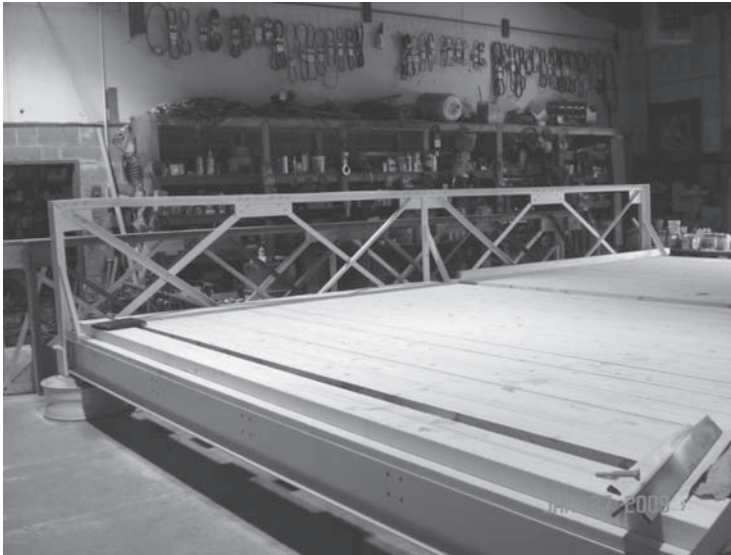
New timber deck and rehabilitated steel framing erected in shop.
